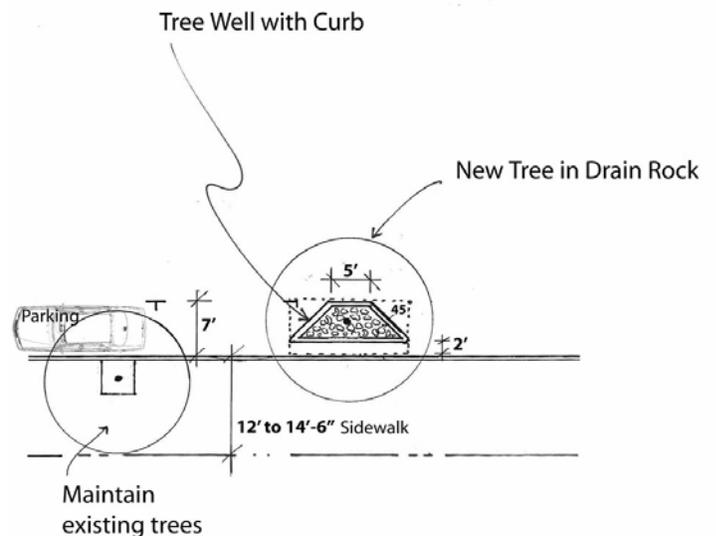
Street tree planters in the parking lane should be designed so as to allow cars and street sweeping equipment to easily turn into parking spaces on either side of them, and to allow water in street gutters to bypass them.
